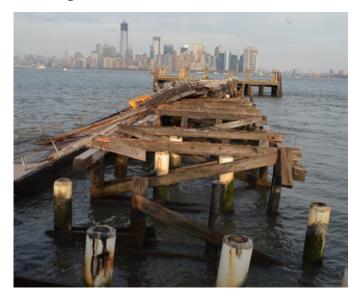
Photo from Liberty Island of damaged dock access. Photograph by Rebecca Beavers, NPS.
